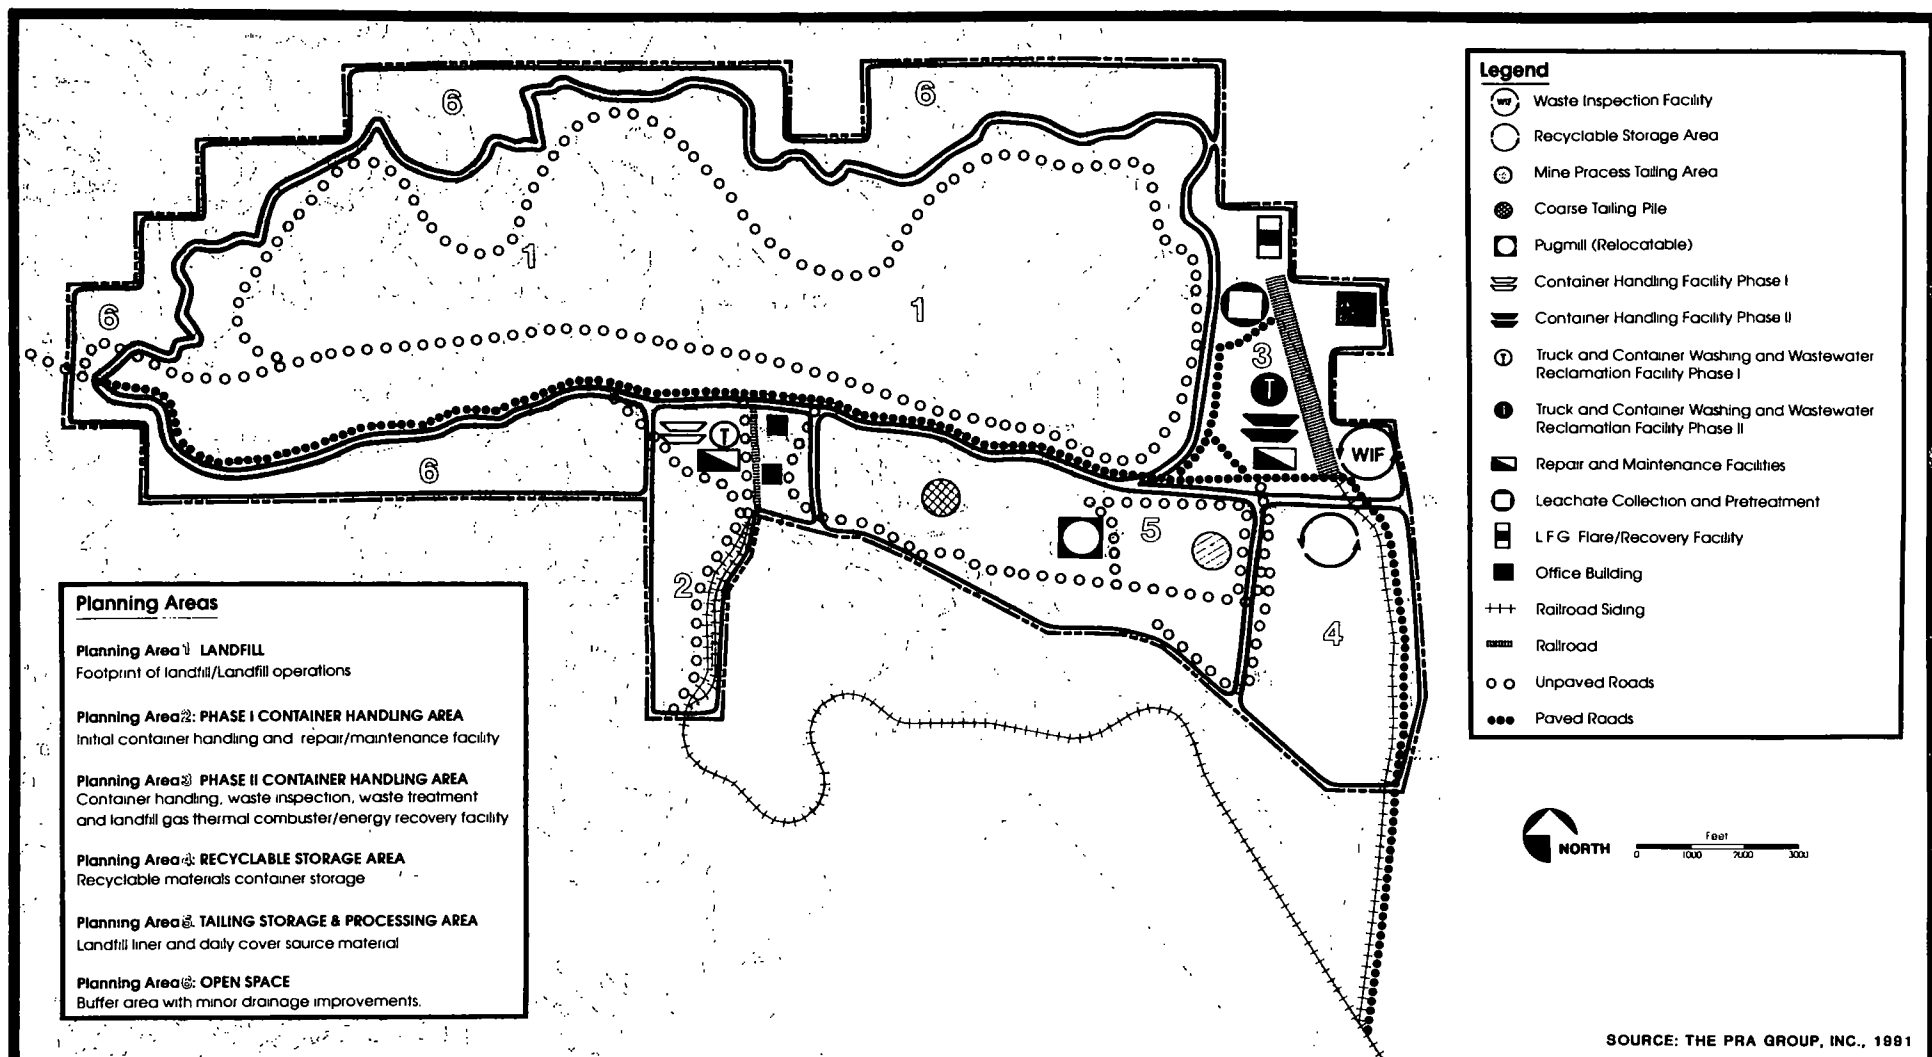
PROPOSED LANDFILL SPECIFIC PLAN AREA WITH DESIGNATED PLANNING AREAS
